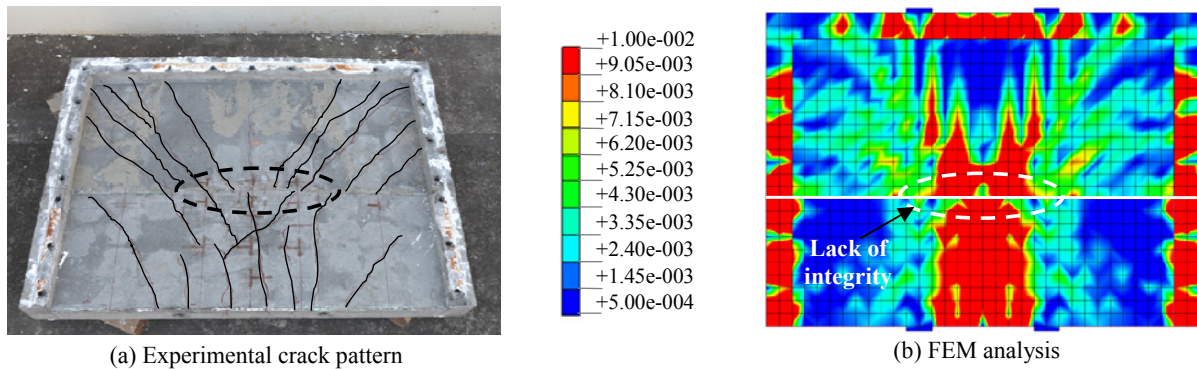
Principal tensile strain on the bottom surface of SL-P0.5.
